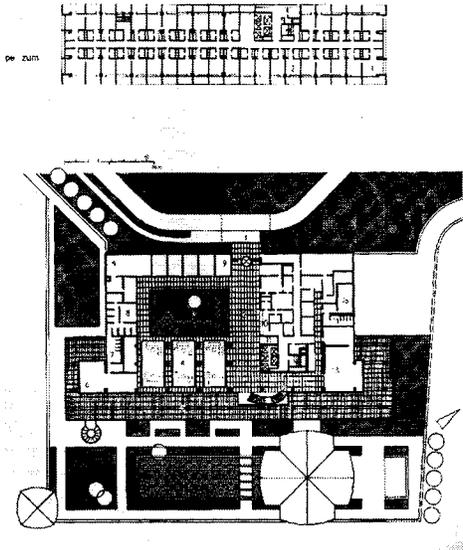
Istanbul Hilton Hotel, Entrance and typical floor plans
